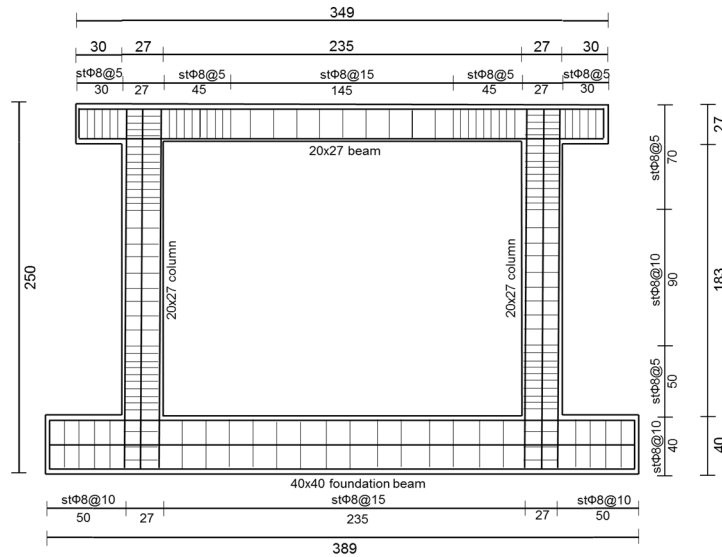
Tests with four point loading: Construction drawings of the RC frame specimen.
